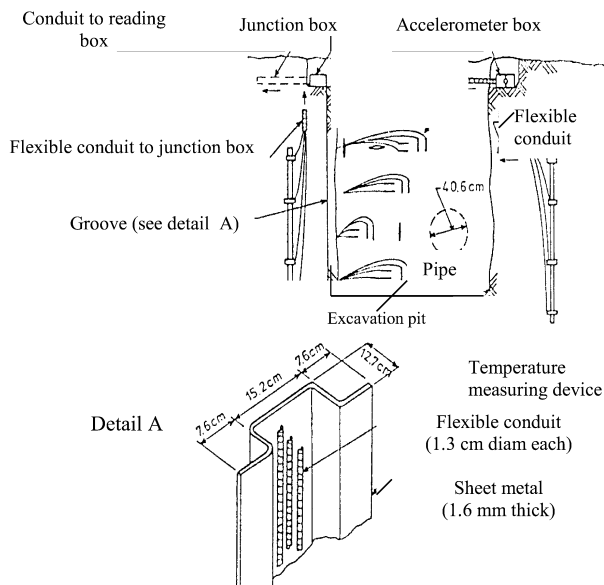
Placement of soil pressure cell in fill of excavation pit [18]
